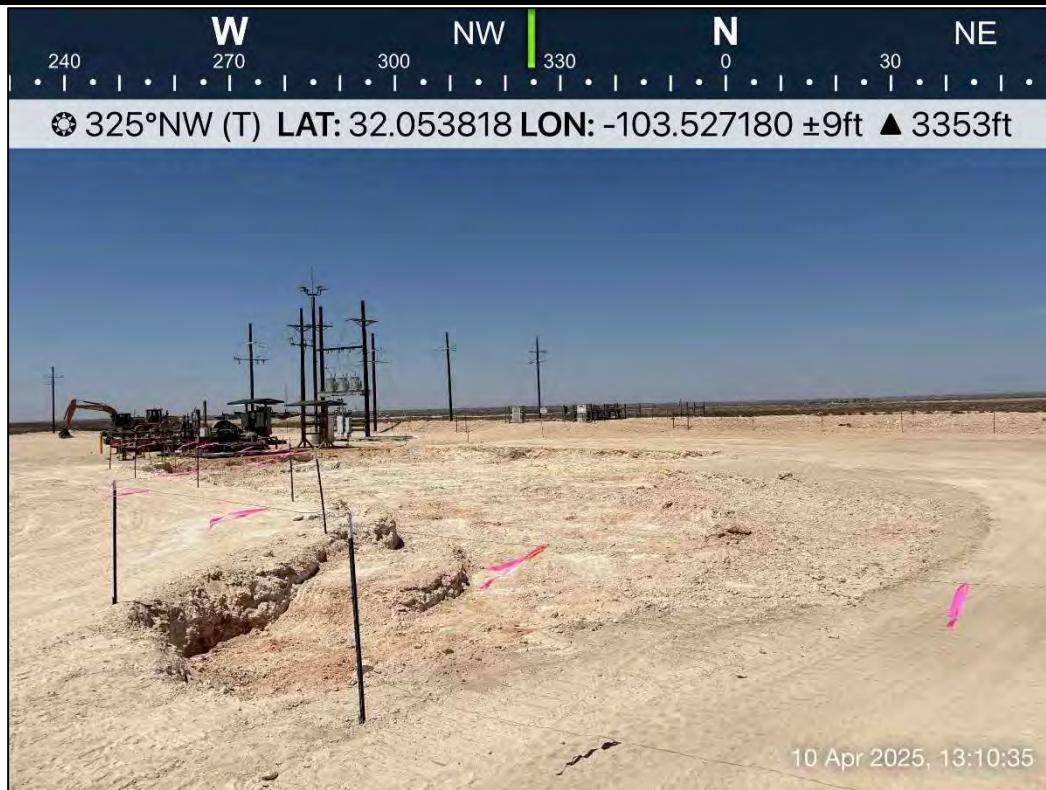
Northwestern view of excavation extent. 4/10/2025
